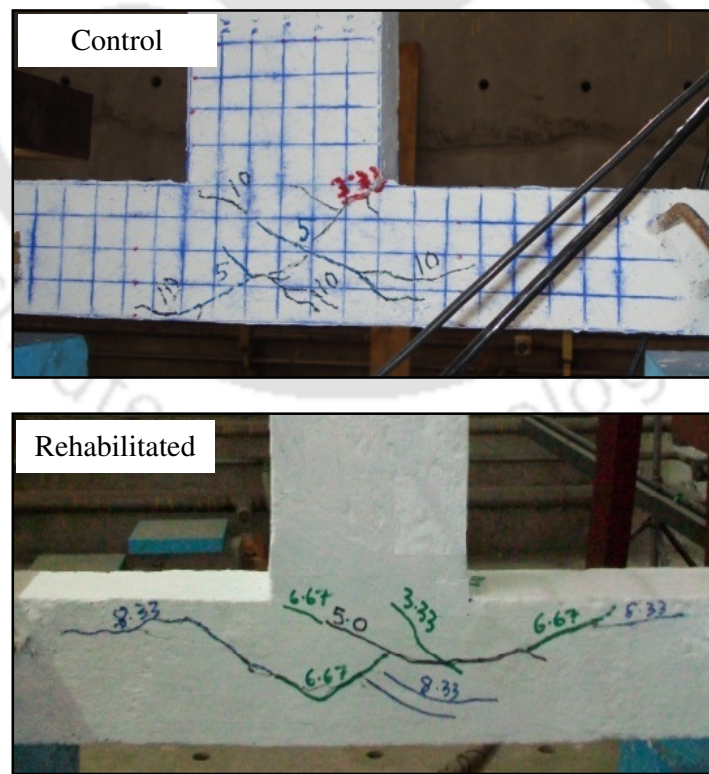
Appearance of cracks for CWSS specimens under loading type-1
